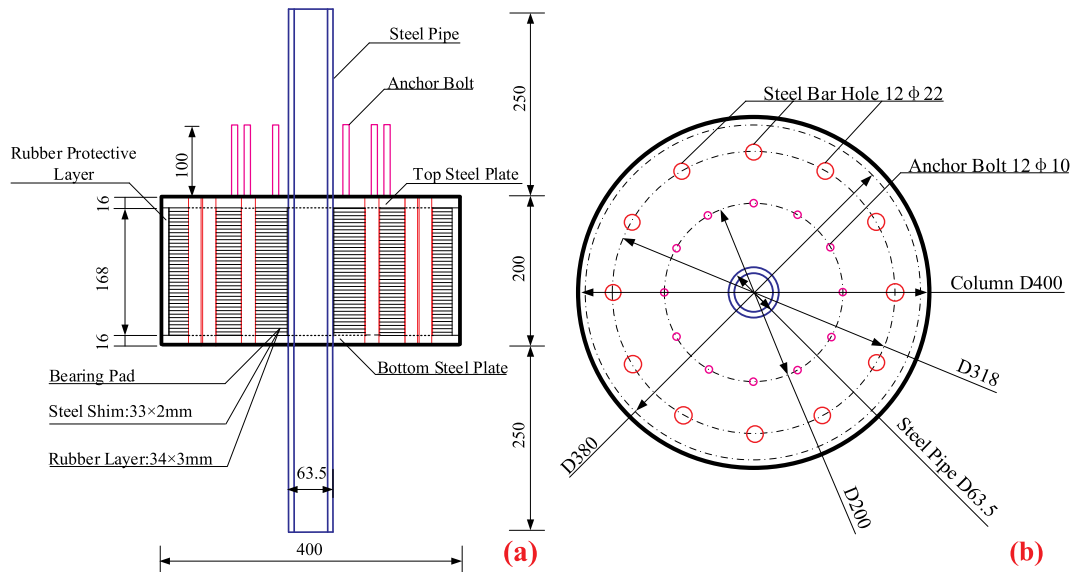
Laminated rubber pad (unit: mm): (a) elevation view; (b) plan view.
